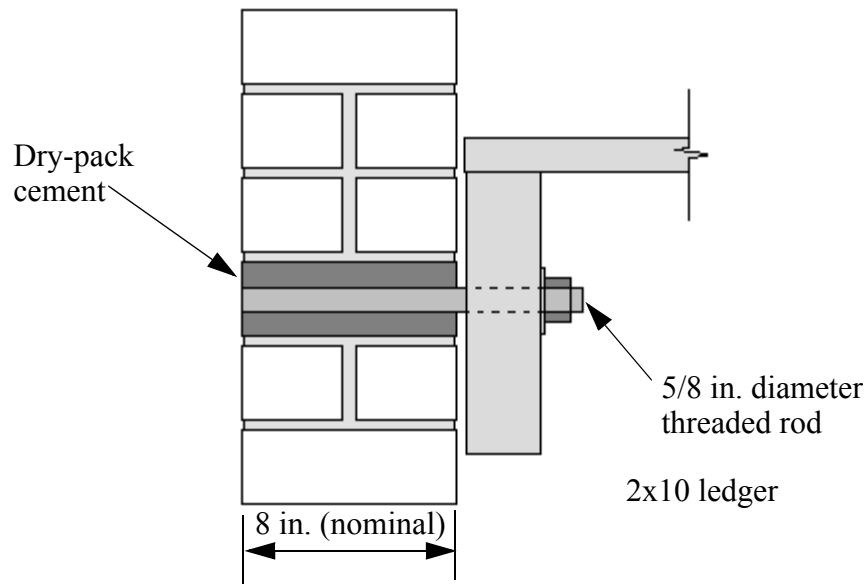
Schematic of threaded rod shear connection (Walls 1 and 2).
